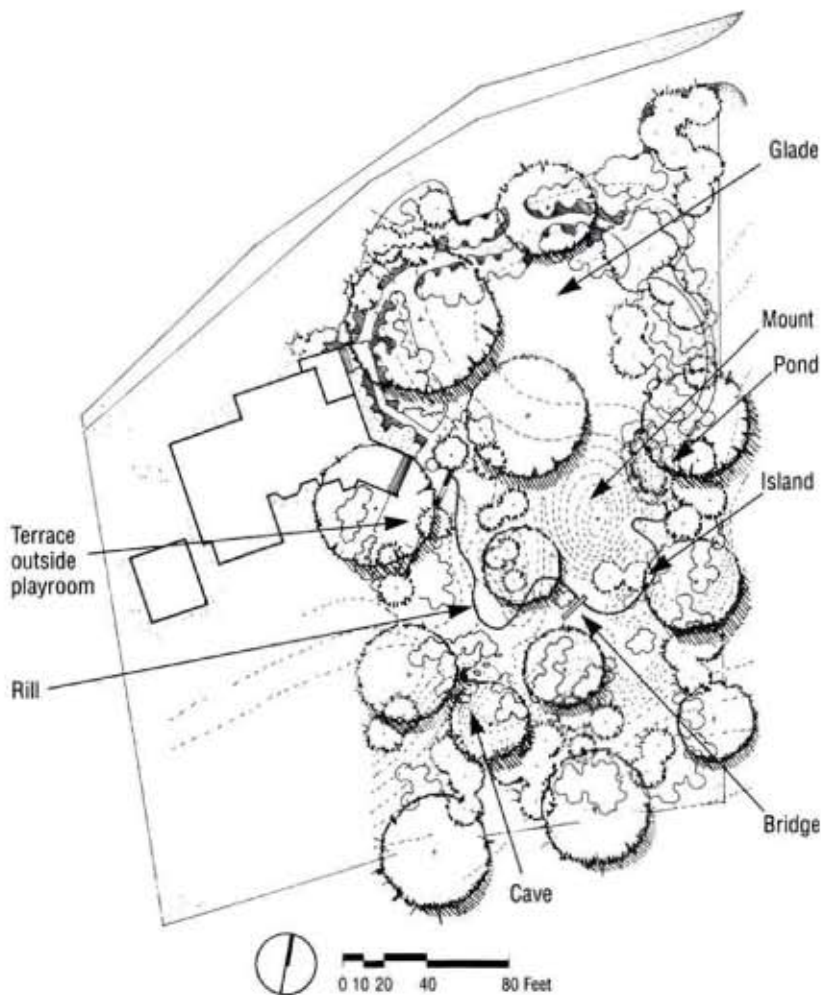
Site plan of the Therapeutic Garden, Institute for Child and Adolescent Development, Wellesley, MA.
